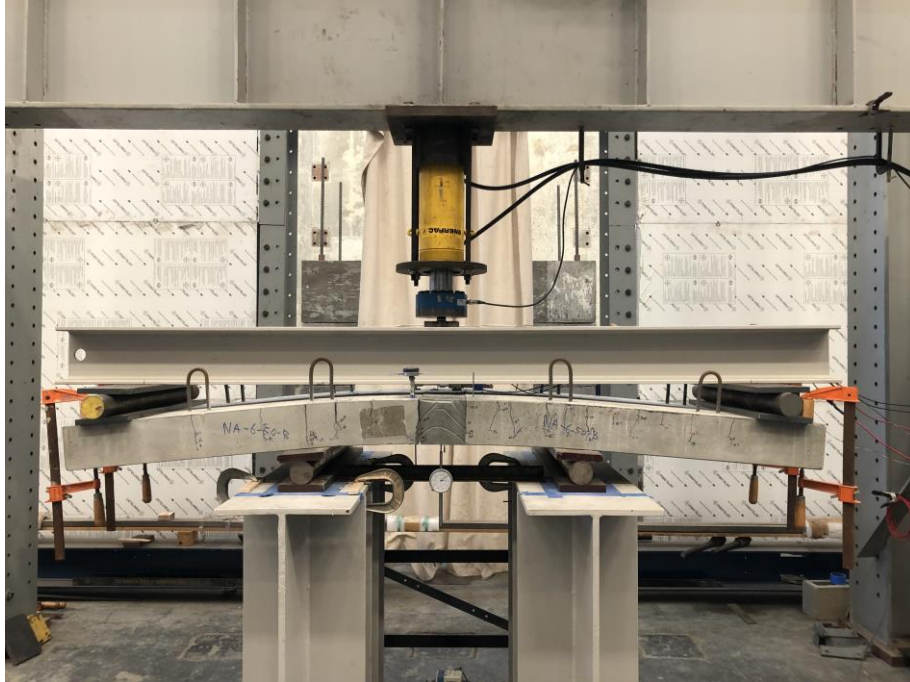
Photo. Diagonal cracking in concrete panel at nominal capacity of specimen.
